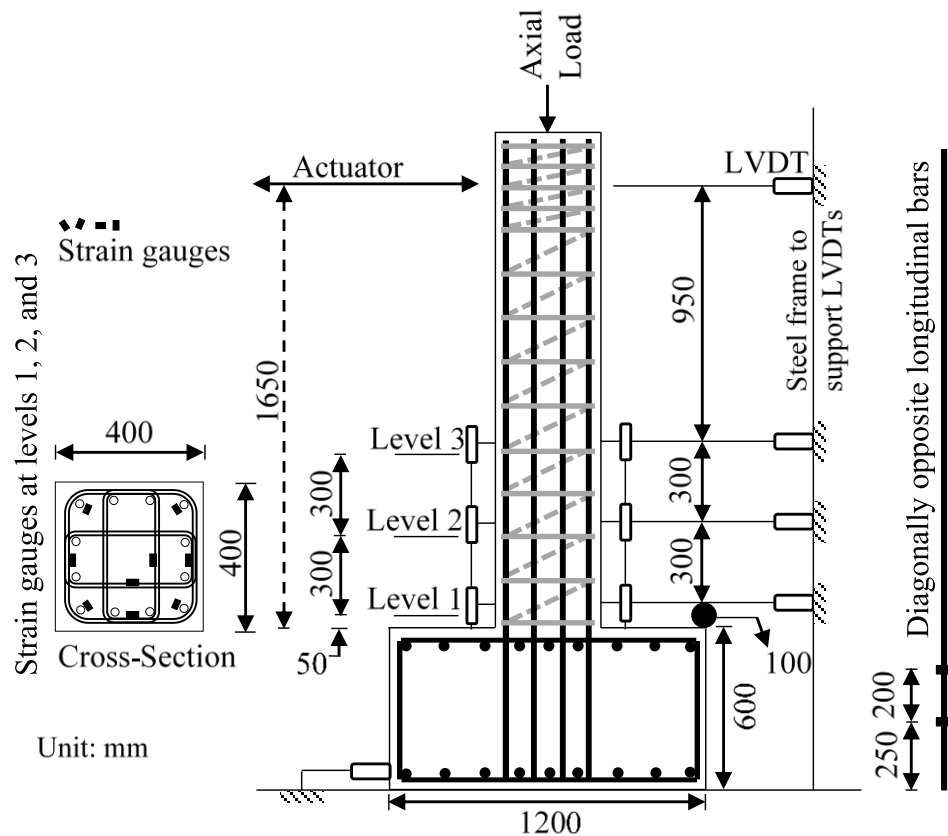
Test specimen details, strain gauges and LVDT locations
